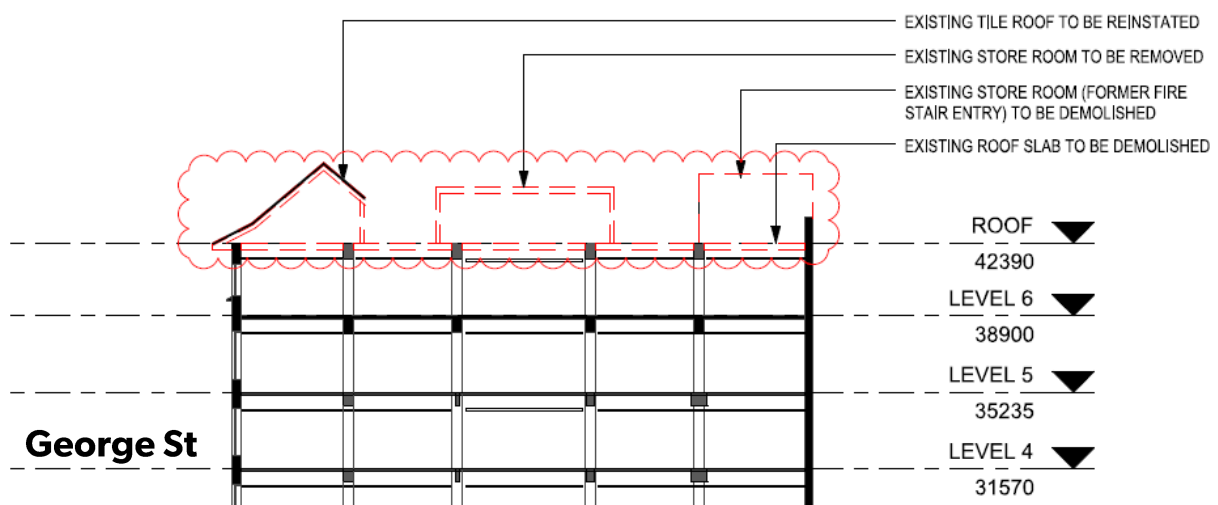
| Proposed demolition plan (Base source: Applicant's Modification Report)
